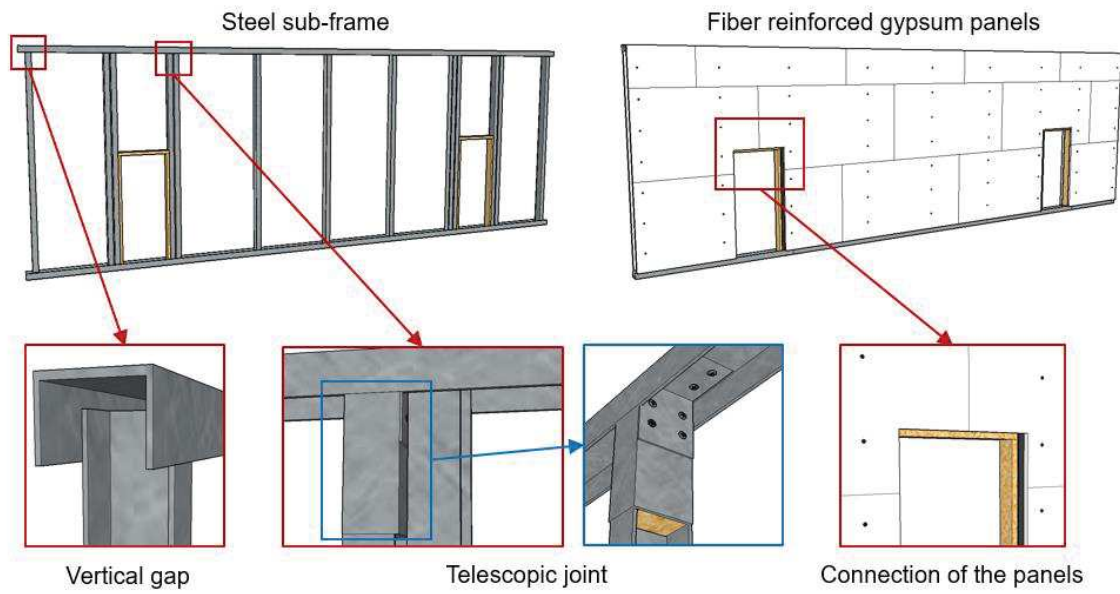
Detailing of the fiber-reinforced ceramic gypsum partition walls.
